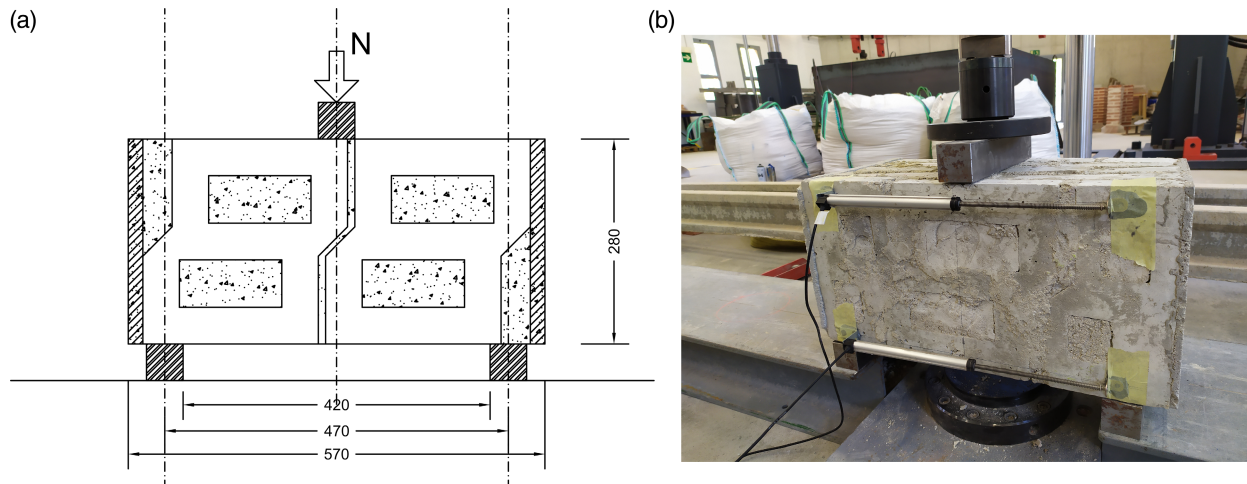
Bending test set-up: (a) simple bending load set-up on a standard specimen (dimensions in mm), (b) an image of the experimental test
